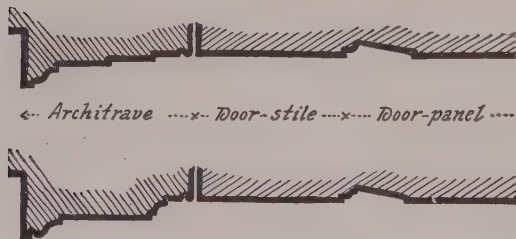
Fine examples of Colonial architraves and door mouldings with raised panels
